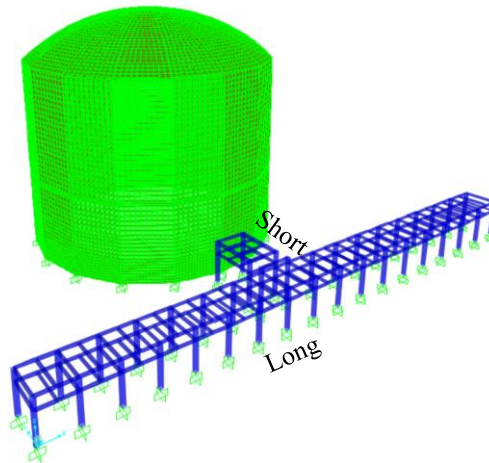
The RC pipe rack (short and long) and the storage tank as modelled in [21]
